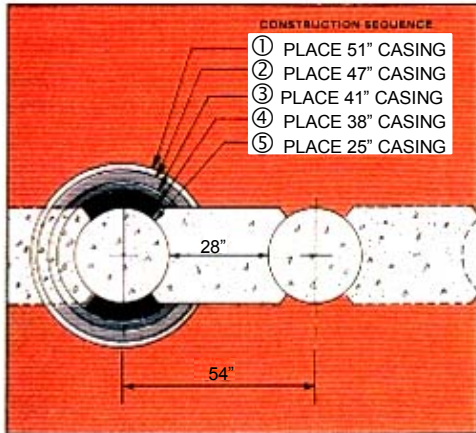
Wall Configuration in Plan, Wolf Creek Dam, KY (ICOS Brochure, Undated)
